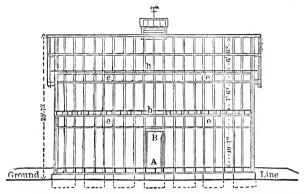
Longitudinal Section (through Alley or Drive-way).—A, Position of Sheller in Alleyway; B, Opening to Cribs; eee, Continuous Openings for Filling Cribs; h h, Well-holes through Middle and Upper Floor.
